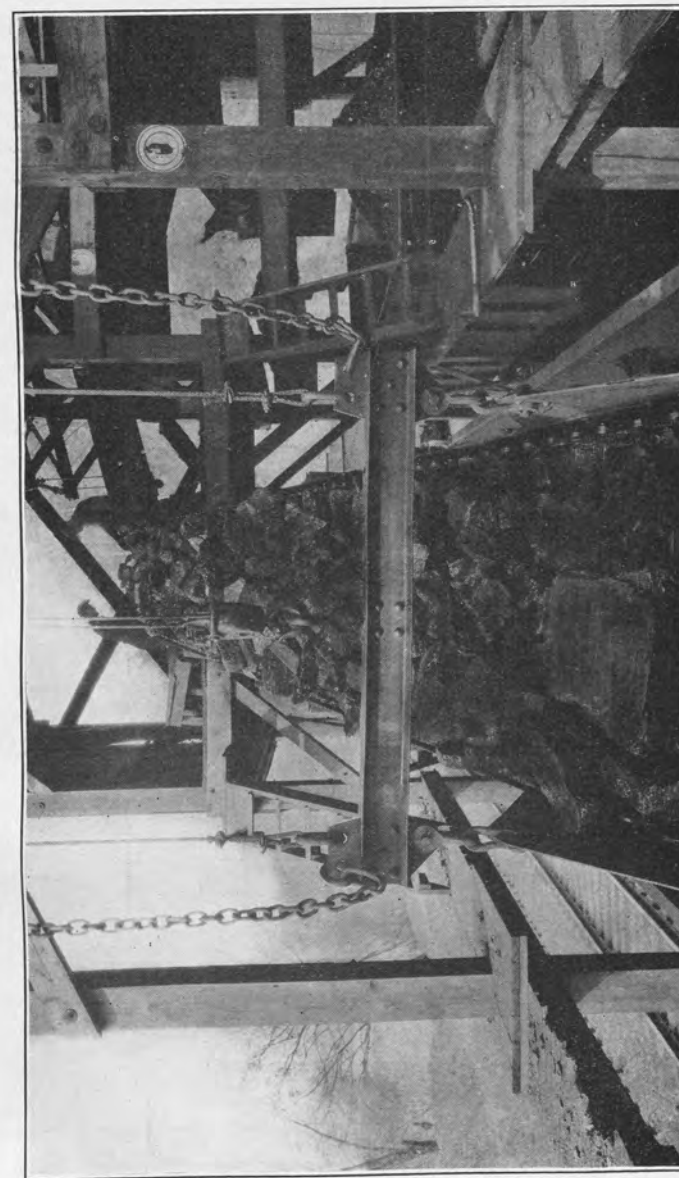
NEAR VIEW OF LOADING CONVEYOR.
